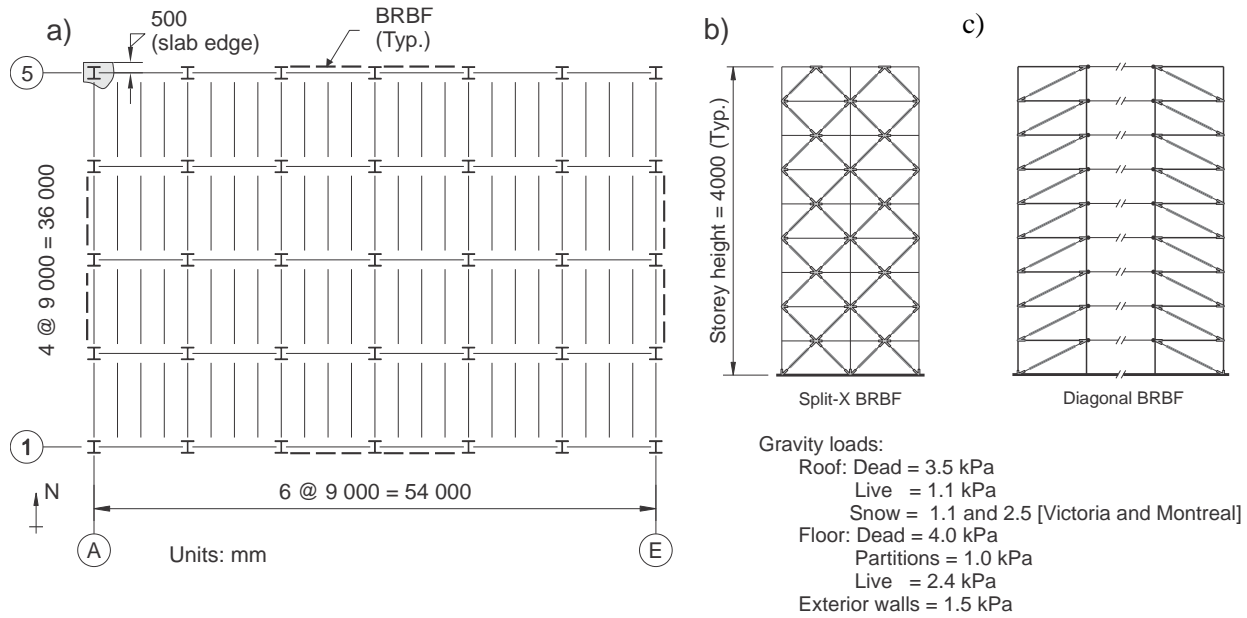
a) Typical plan view of the building prototype (only Split-X option is shown); b) and c) Elevation of the 9-storey Split-X and Diagonal bracing patterns.
